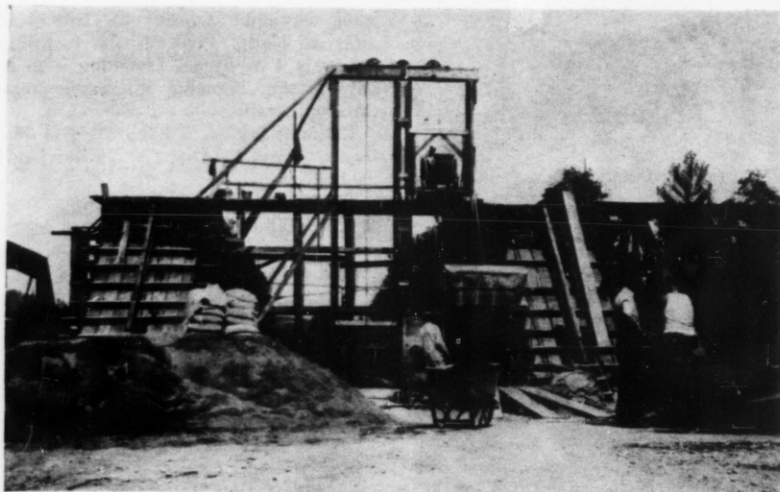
CONCRETE MIXING PLANT and hoist. Mixing was performed with a 2-sack machine on the south approach span, concrete being wheeled along runways on the top chord.
